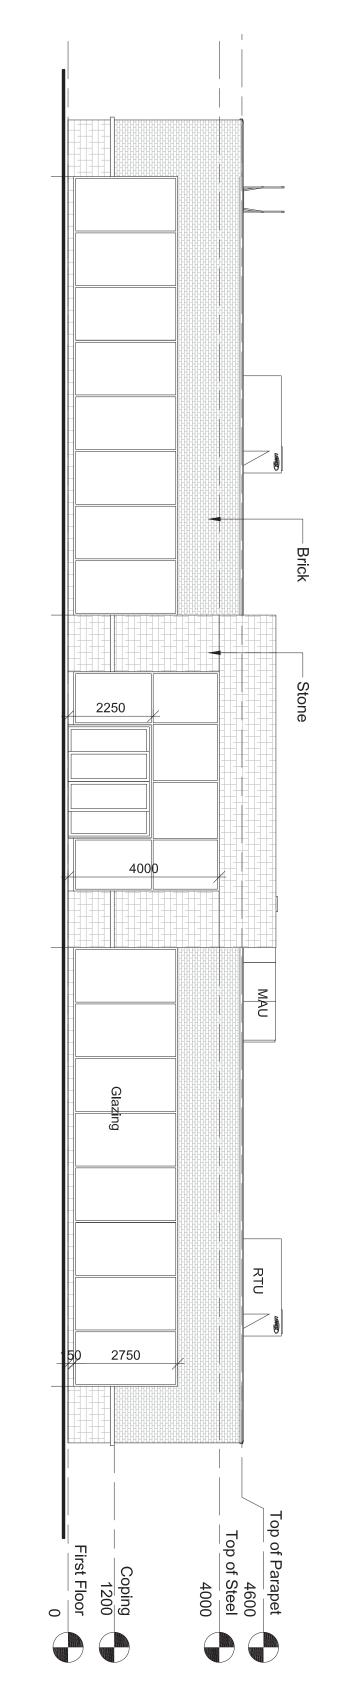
Site Plan Exhibit 2 - Building Elevations
